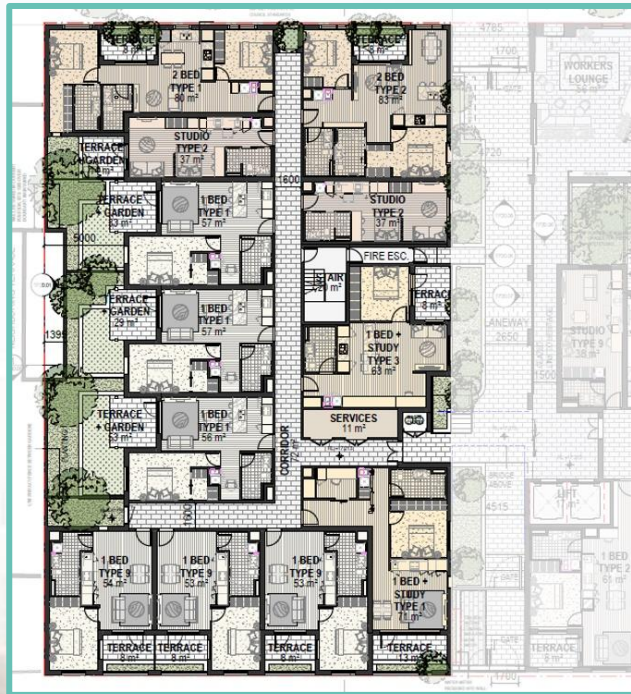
Northern building ground-floor plan. Source: Warren and Mahoney.
